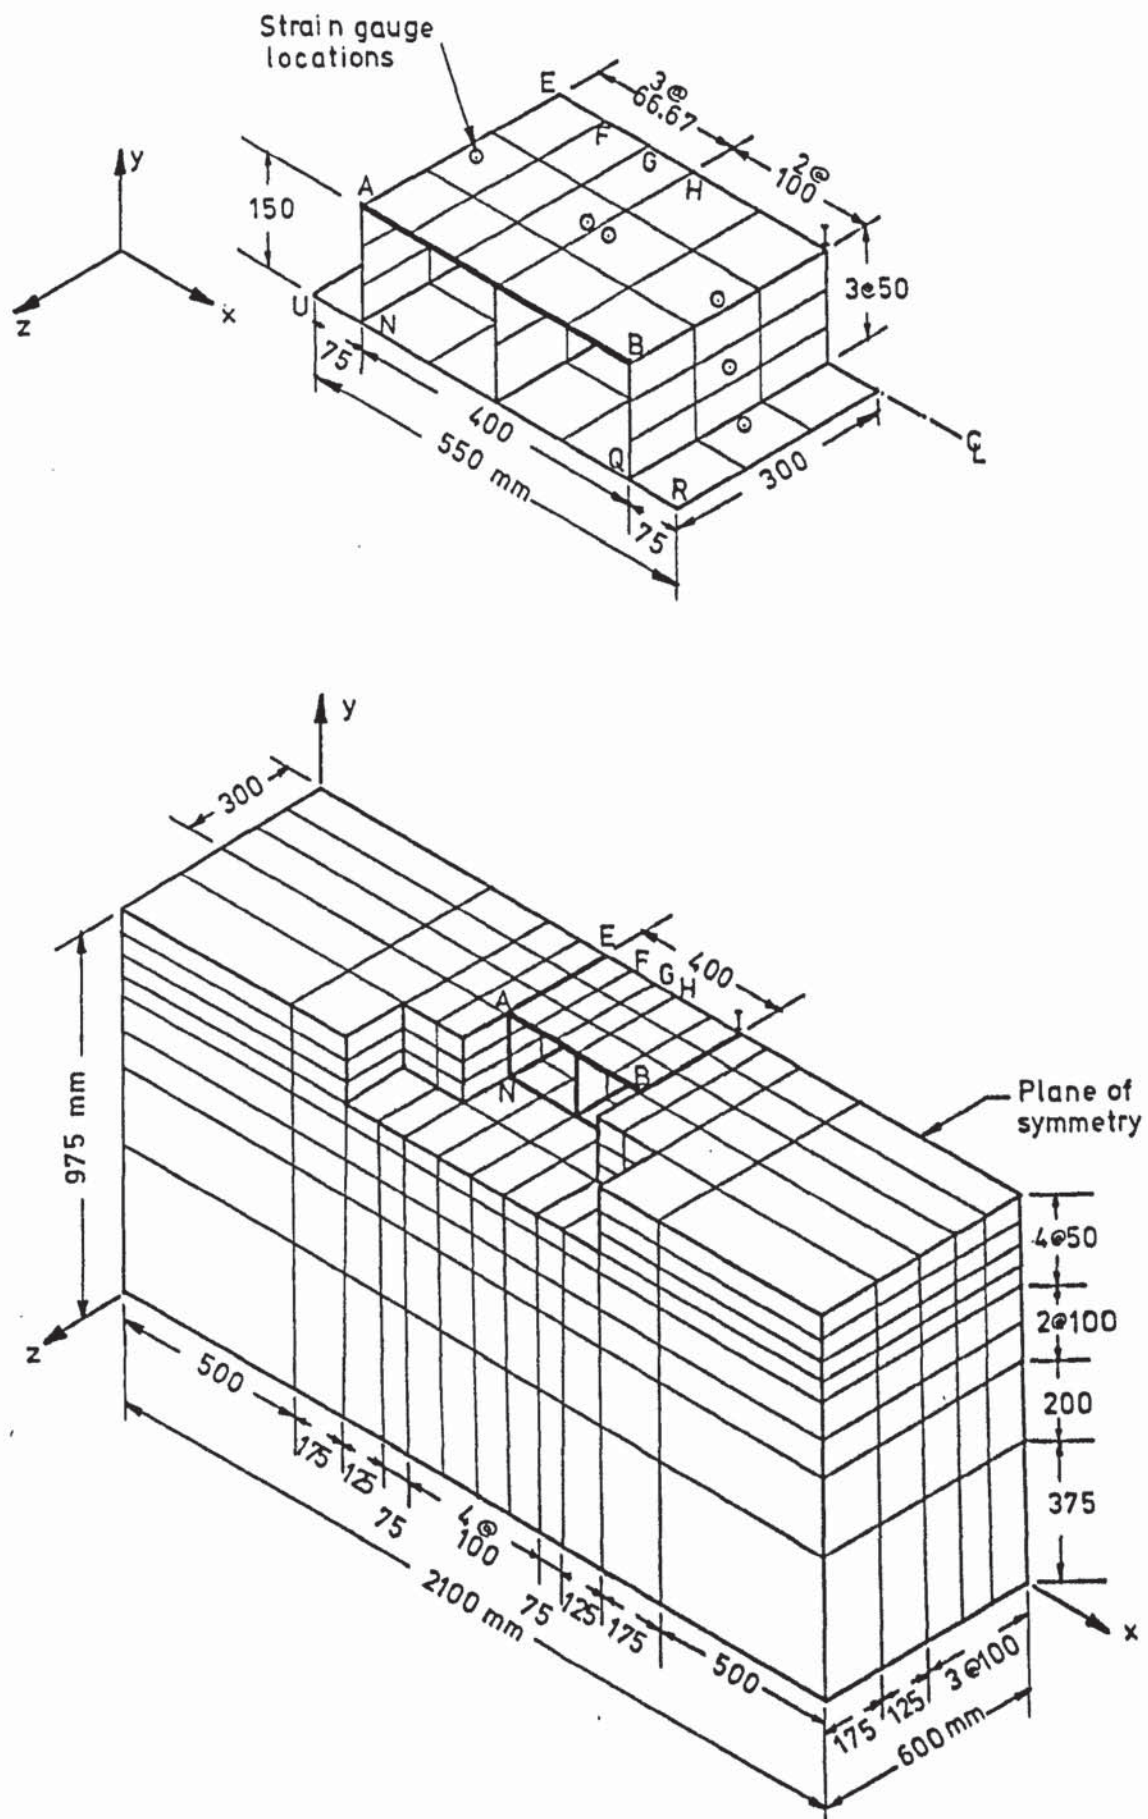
FINITE ELEMENT MESH OF HALF BOX CULVERT
